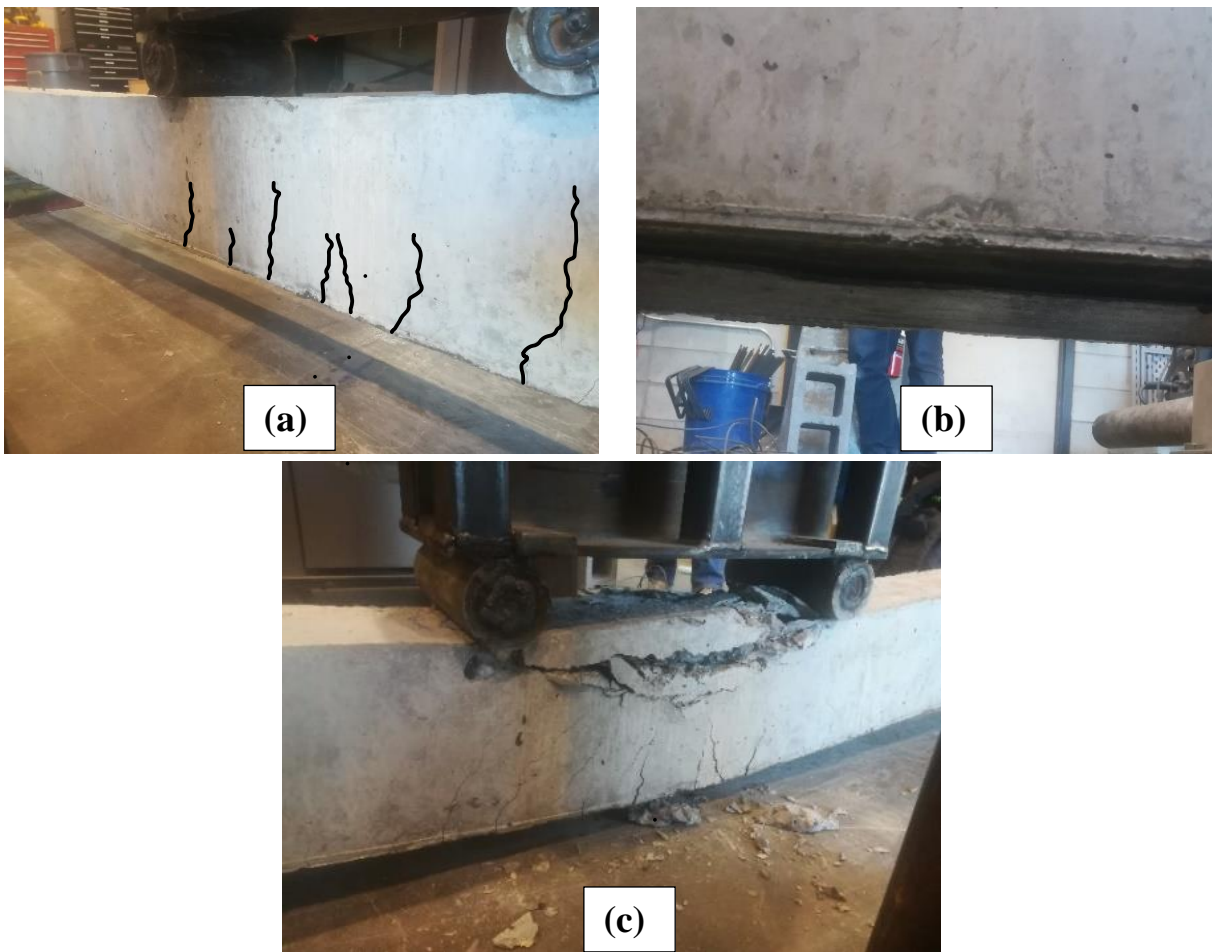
SBLRT beam failure; (a) Flexural cracks, (b) Debonding of longitudinal FRP, (c) Concrete crushing.
